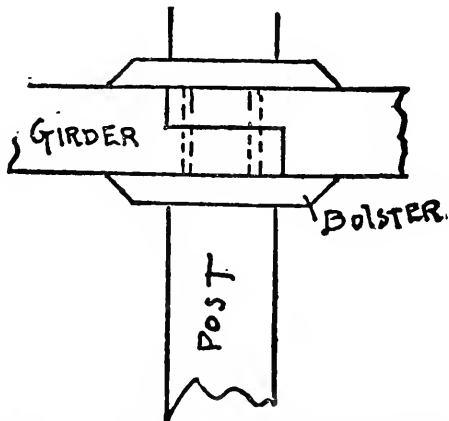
Halved and Dowelled Joint for Timber Girders.
